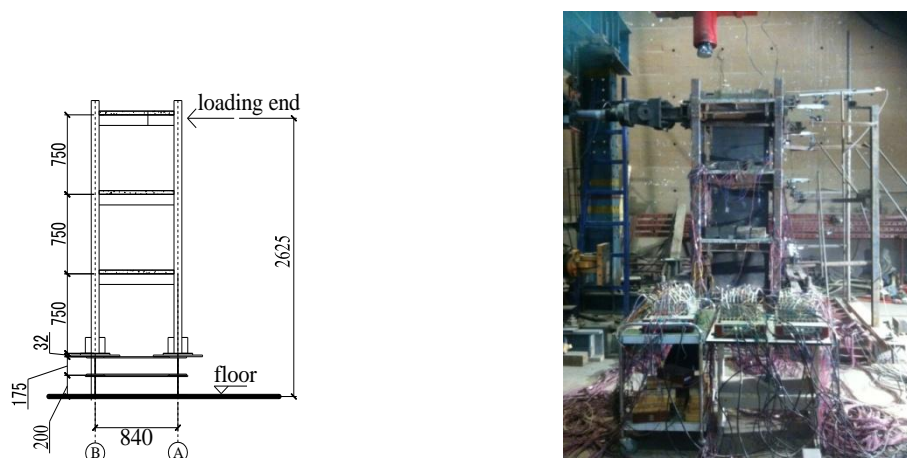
Test set-up of the frame-shear wall structure (Units: mm)
